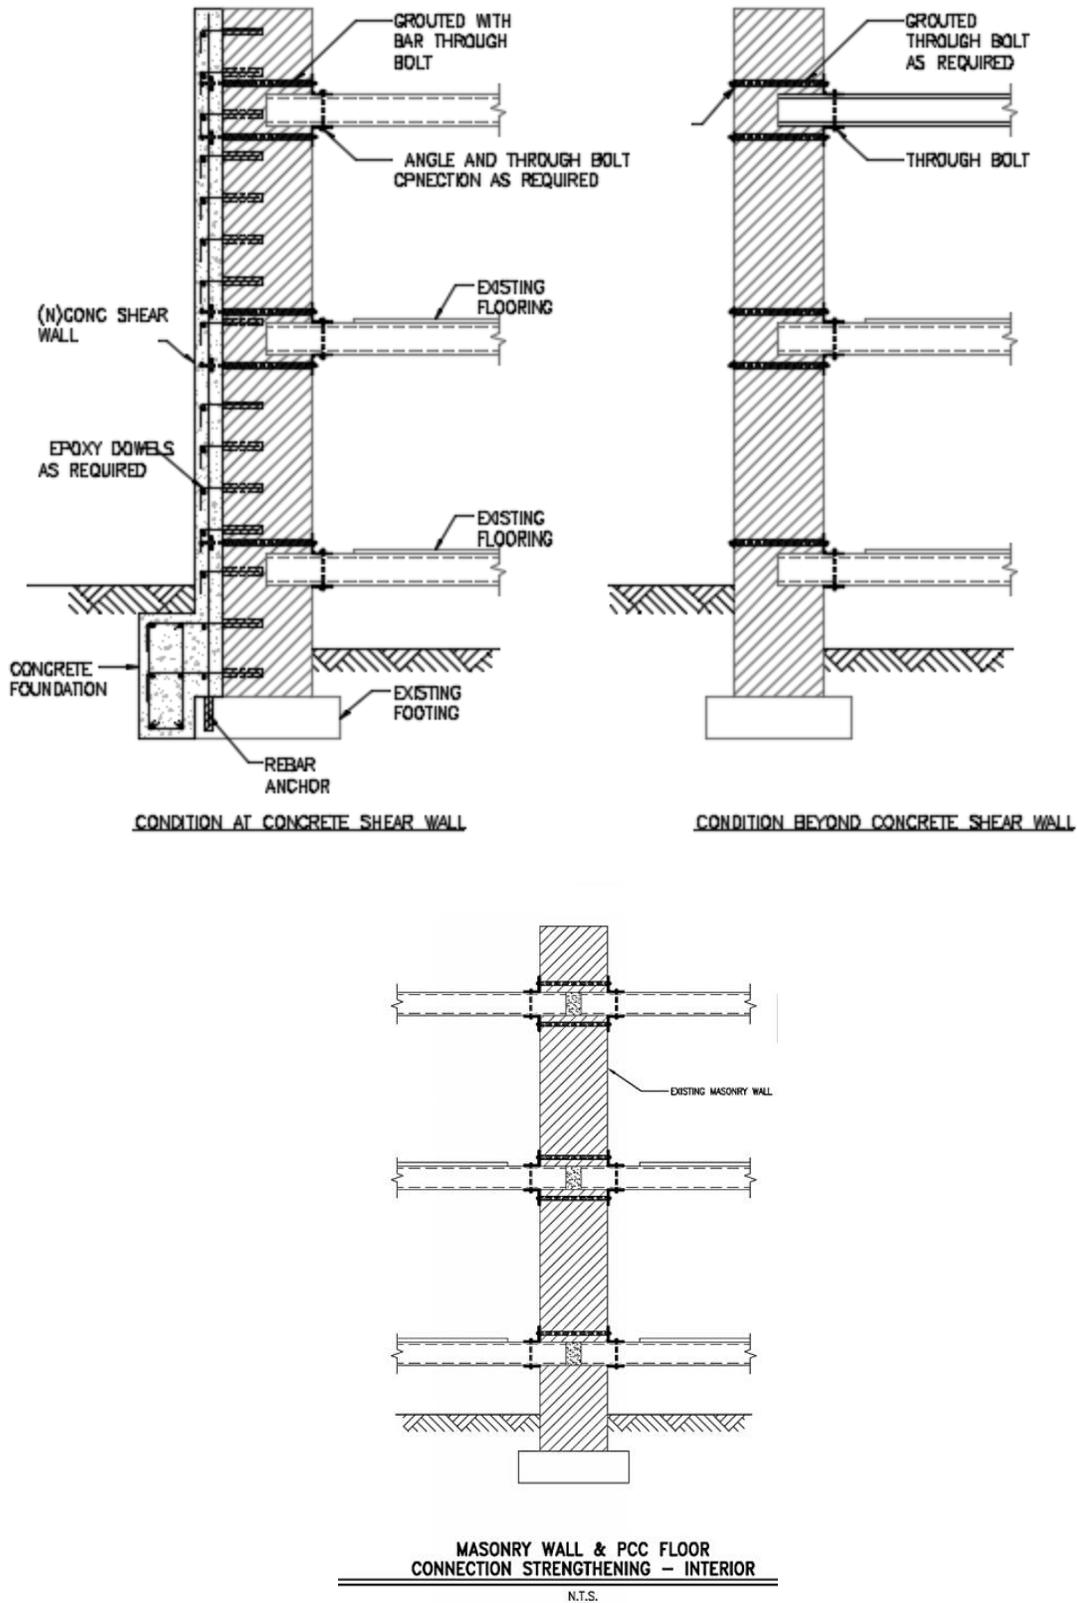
Strengthening of existing walls with RC Shear walls, connection details
